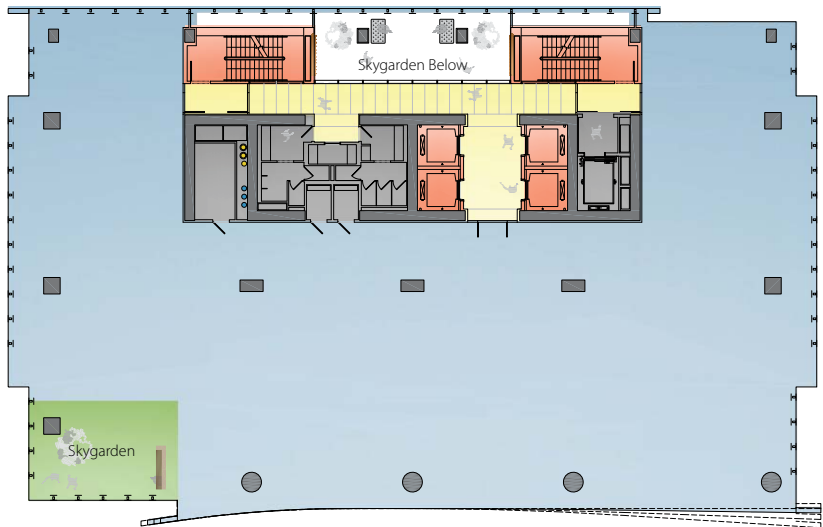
A side-core office floor plan encourages access and use of egress stairs, and provides opportunities for outdoor space. © FXCollaborative
